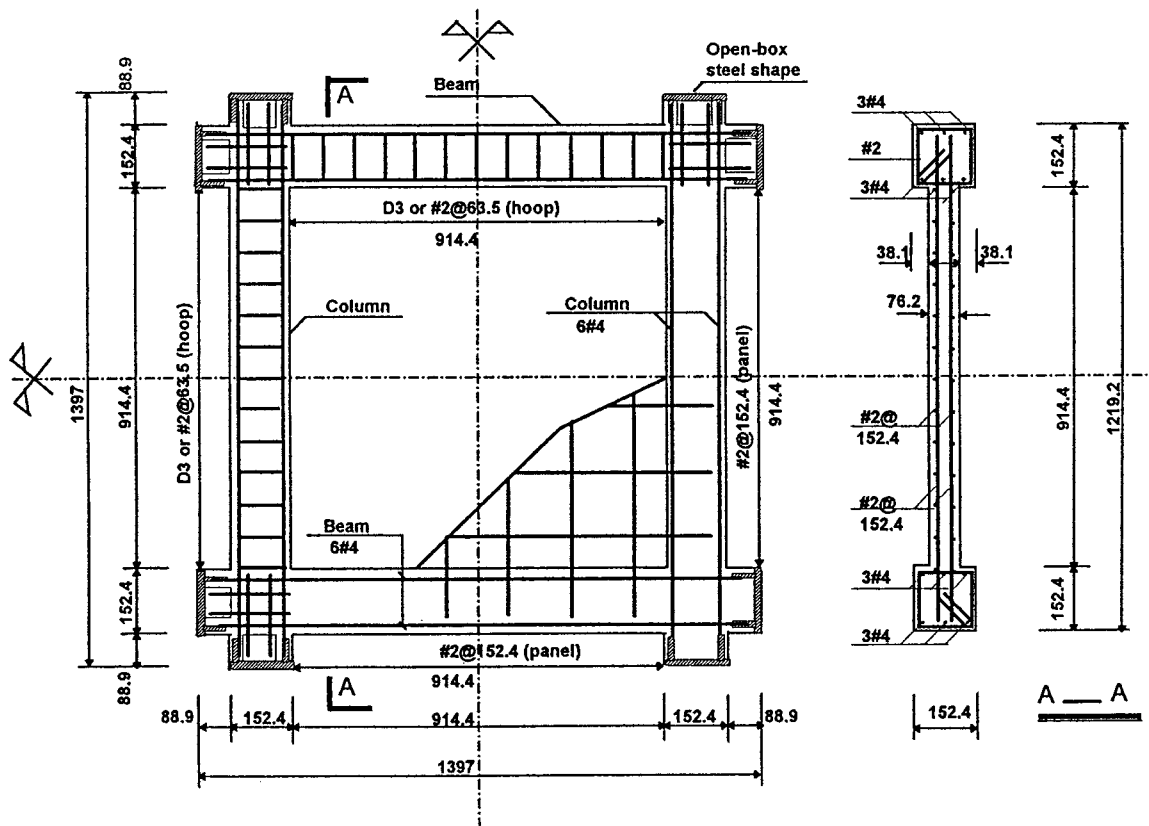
Specimen Dimensions, Typical Steel Arrangement in Framed Shear Wall
